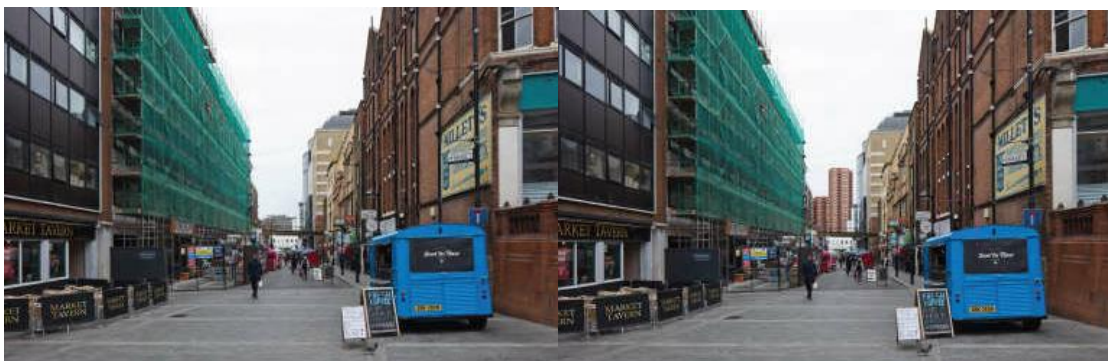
and 45: view from Tamworth Road at the junction with Frith Road towards the Site without (left) and with (right) proposal
